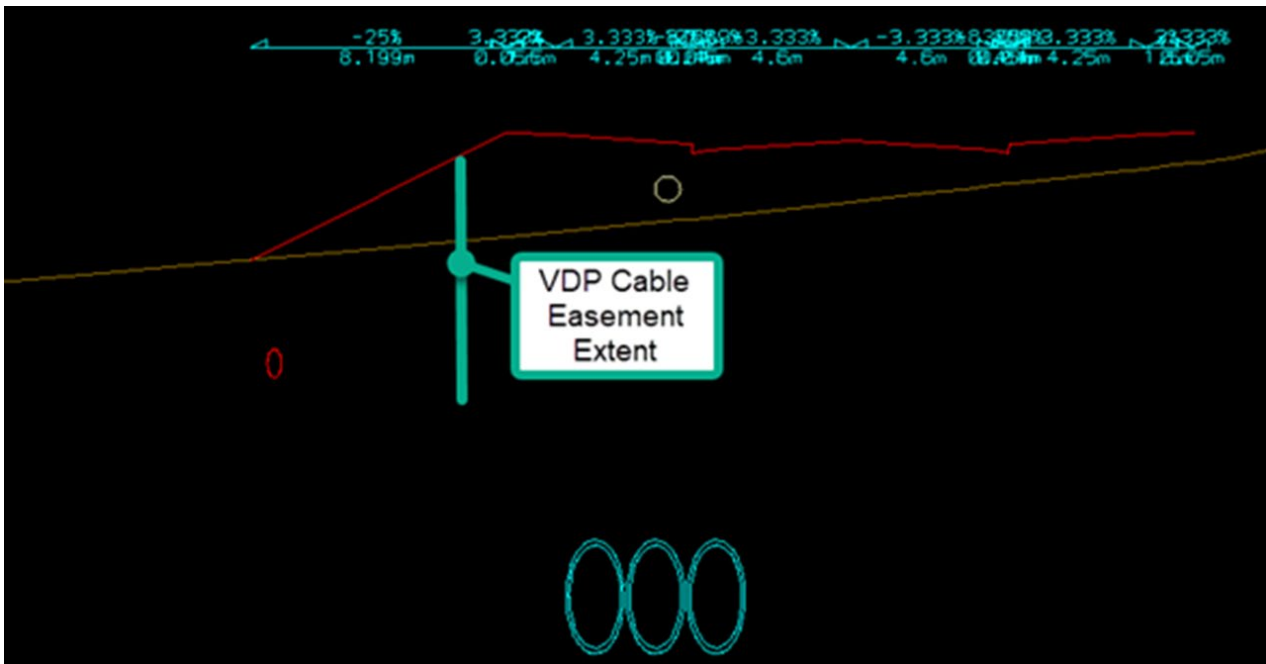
Future overland flow path PSP Road Section (including pipe and proximity to the VDP cable) - Cross-section fill example
